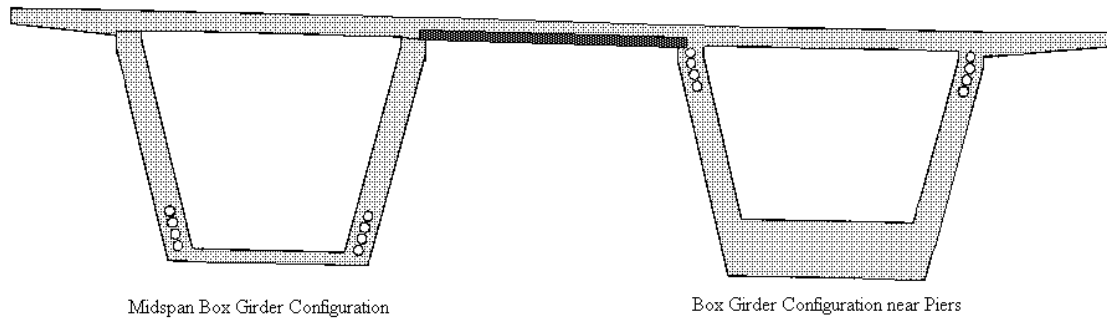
Cast-in-place, post-tensioned box girders with precast panel (darkened portion)
